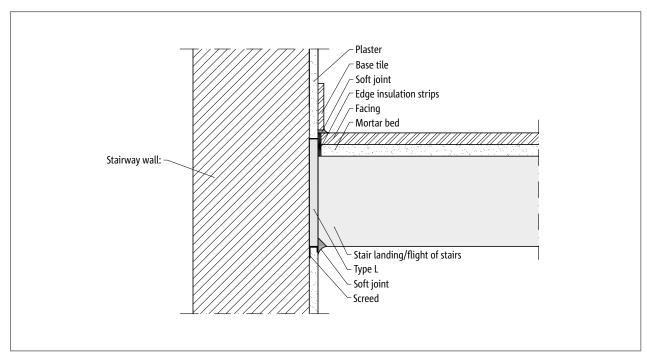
Schöck Tronsole® type L: Installation cross-section precast landing
